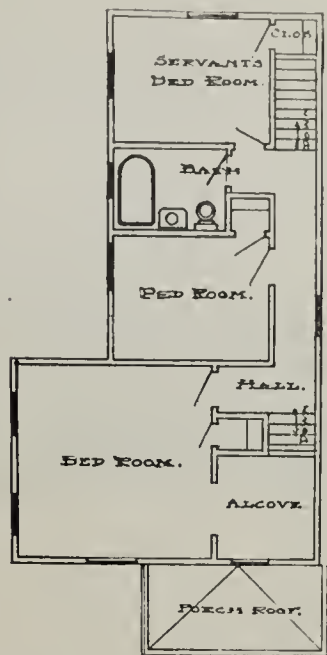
The second-floor plan of the same house. A bedroom toward the rear will make an operating-room by knocking out the north wall and putting in glass.
